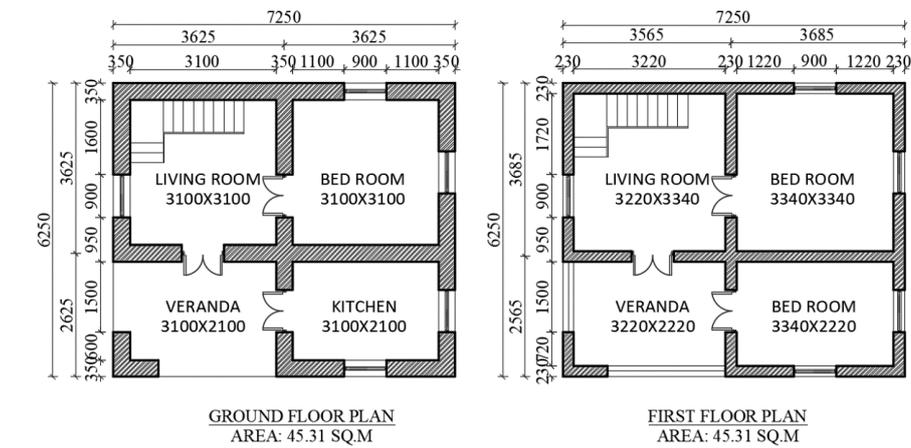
Ground floor and first floor plan BMC 2.3 LB
